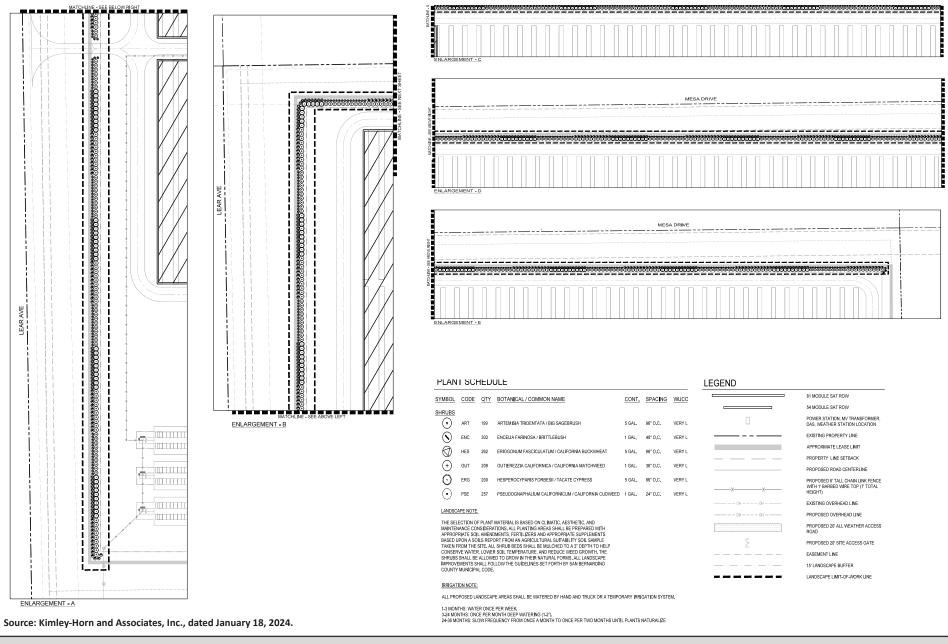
CONCEPTUAL LANDSCAPE PLAN
